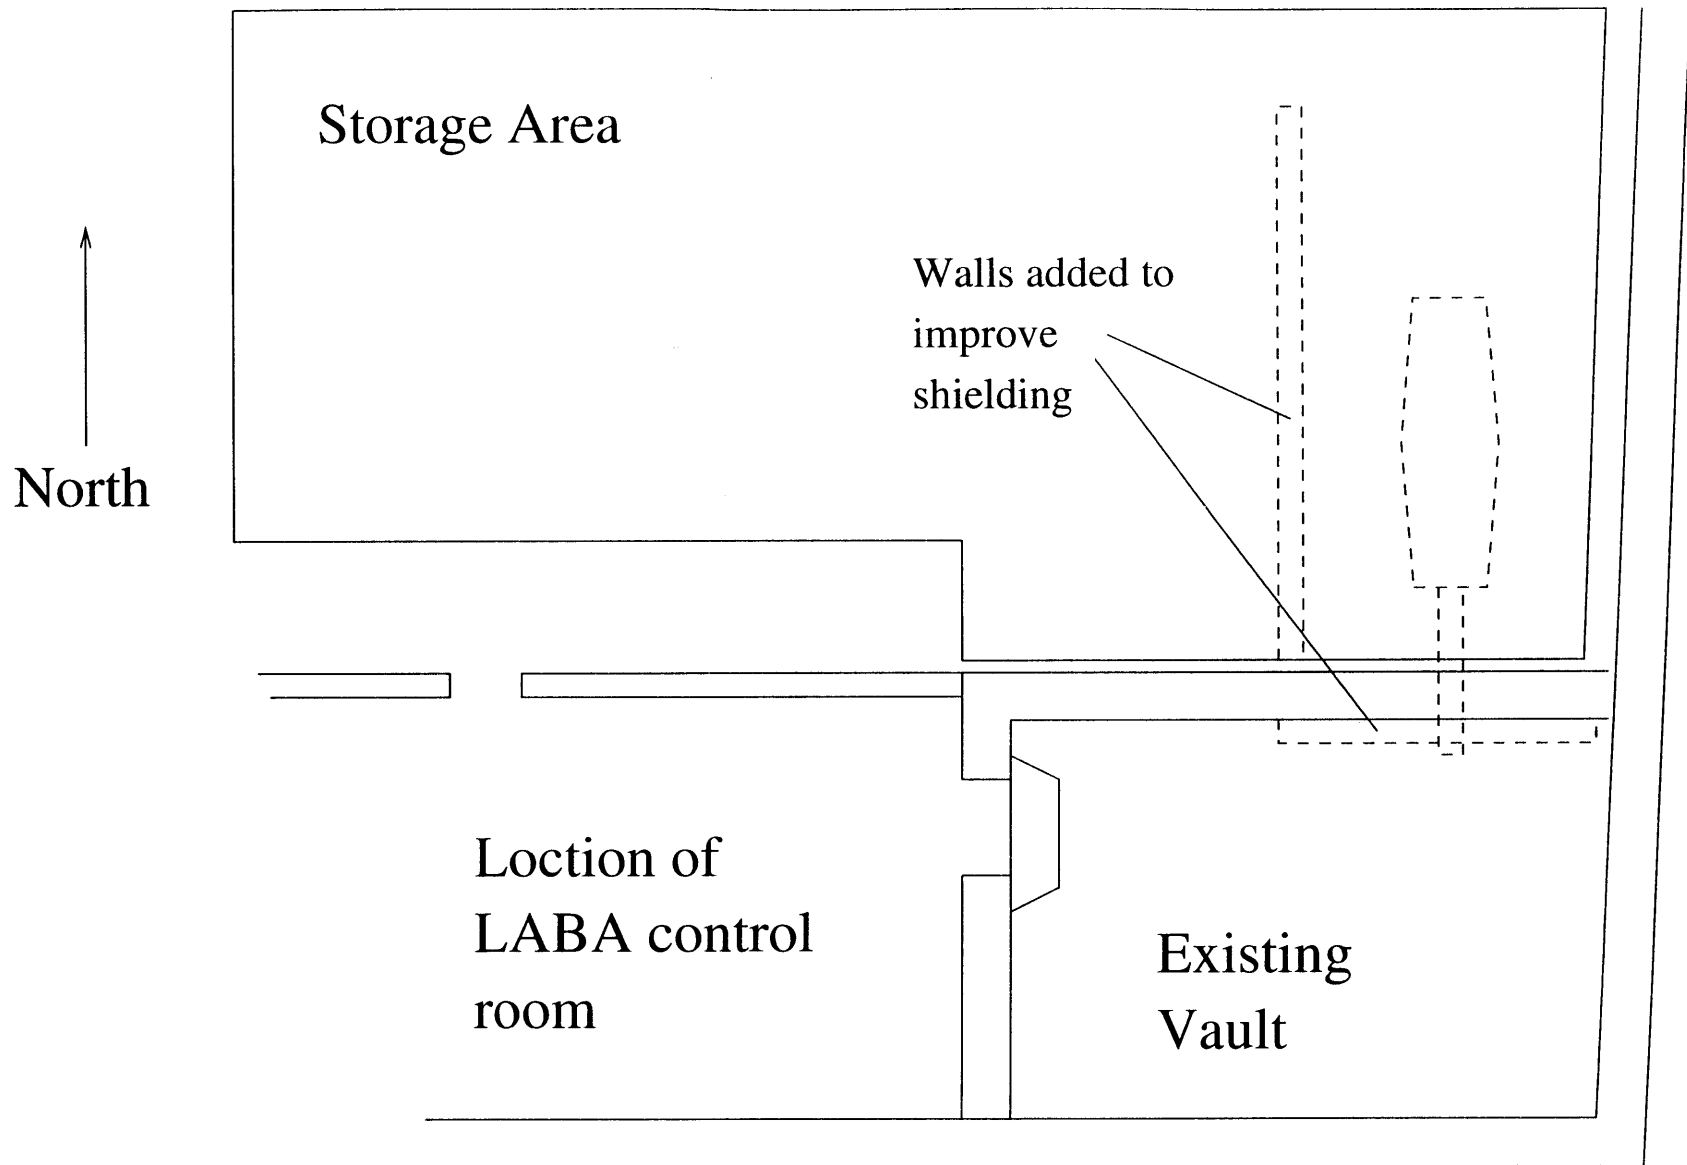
The basement of MIT building NW-13 in the vicinity of the LABA facility prior to renovations. Approximately to scale
